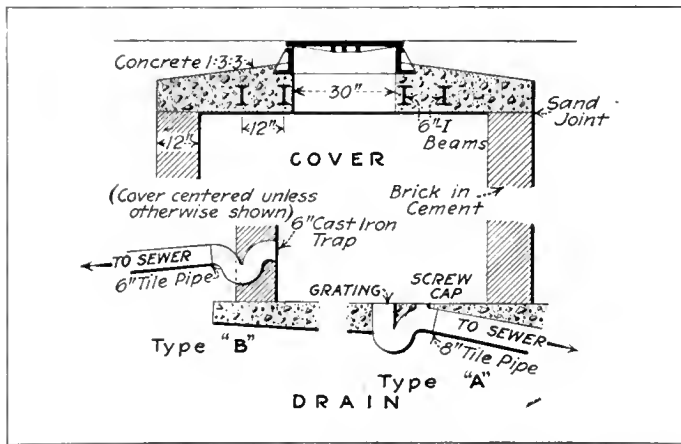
CROSS SECTION OF STANDARD MANHOLE SHOWING TWO TYPES OF DRAINAGE
